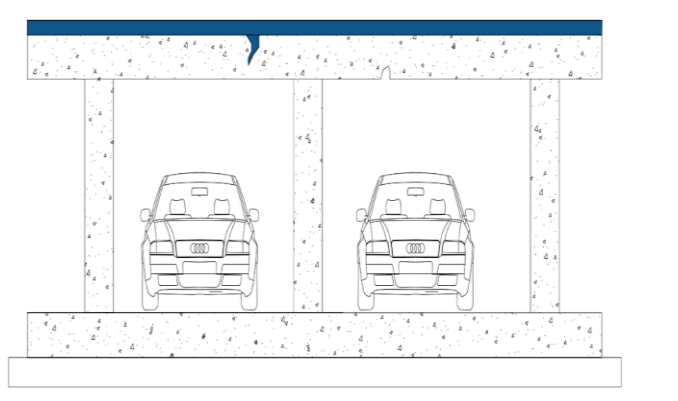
Leakage of water in the cracks of concrete from the pool deck.
